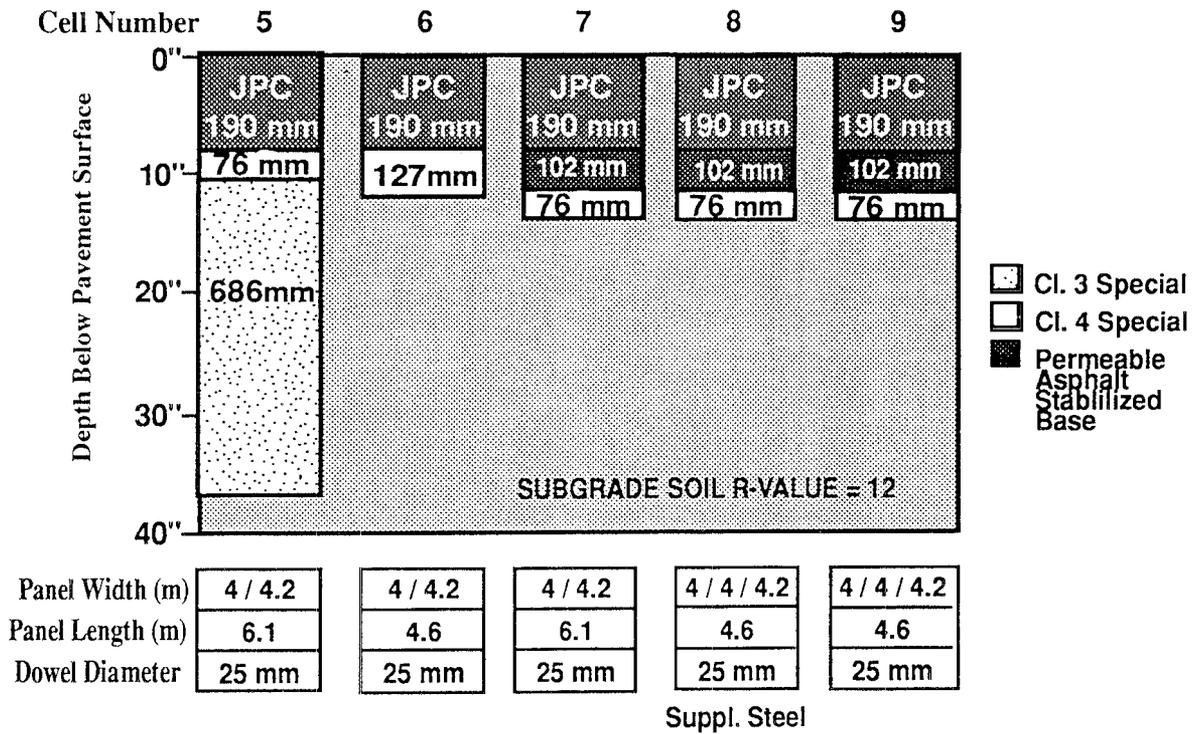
Mn/ROAD 10-Year Mainline Concrete Test Sections
